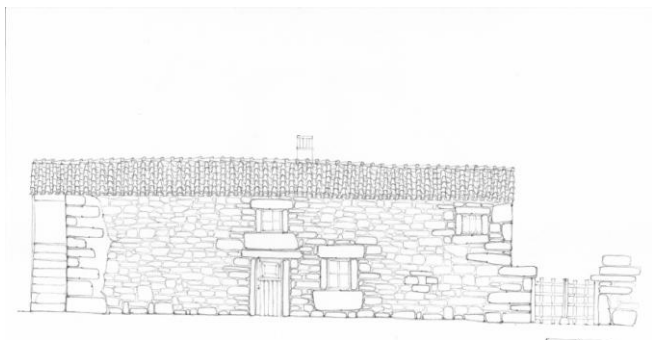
Draw of a facade of a one floor house, drawn by Joana Diogo.
